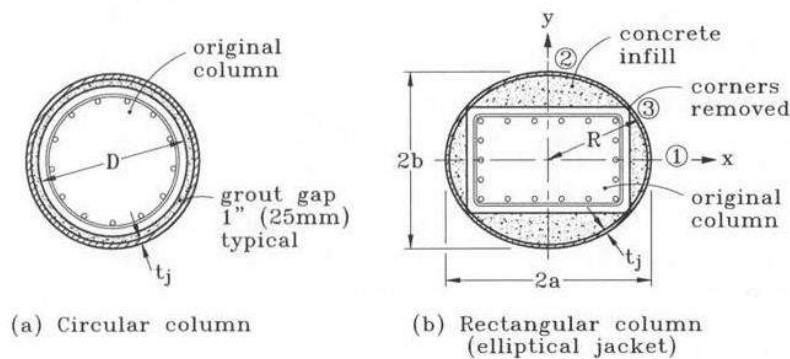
Typical Cross-section Layout of Steel Jacketing Retrofit (Priestley et al. 1996)
